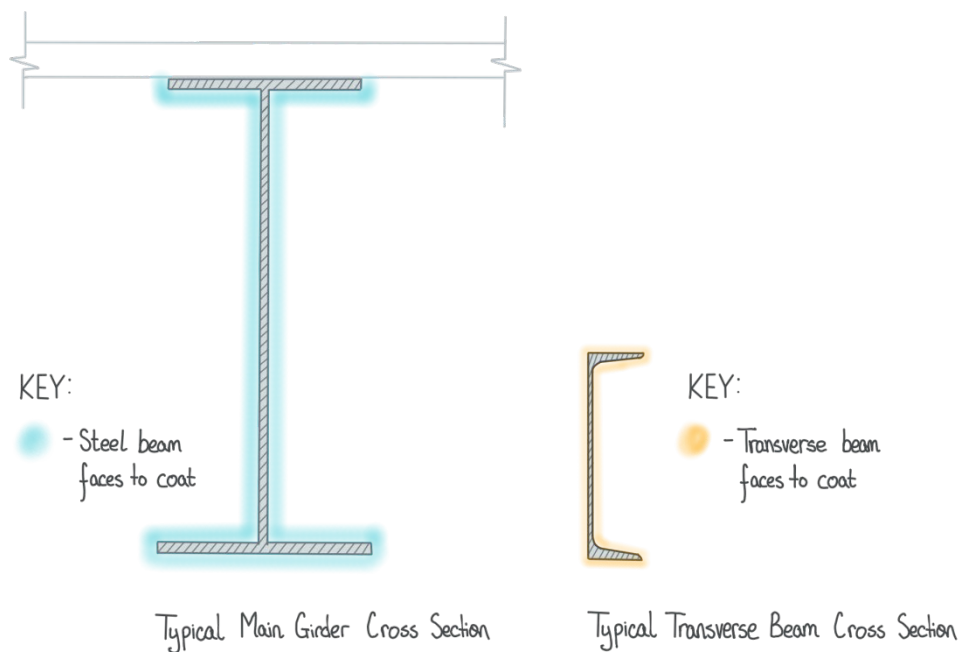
Typical Beam Cross Sections – Showing Faces to be Coated.
